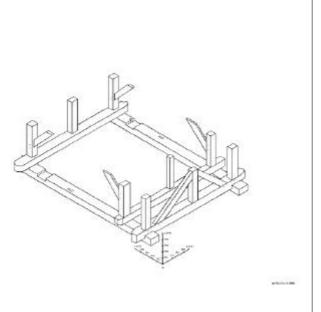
Plan of the Gascoigne bridge after alterations in 1560/61 AD
